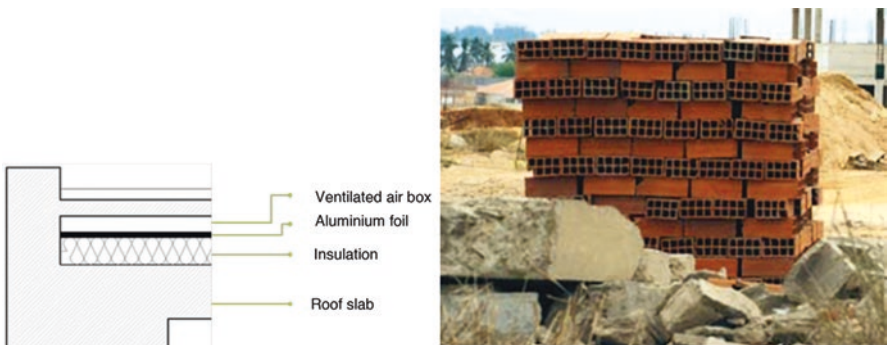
Left: schematic representation of a radiant barrier on a roof, with ventilated air box. Right: the use of perforated brick may improve the building's insulation, though it should be further reinforced with external or cavity wall insulation materials
